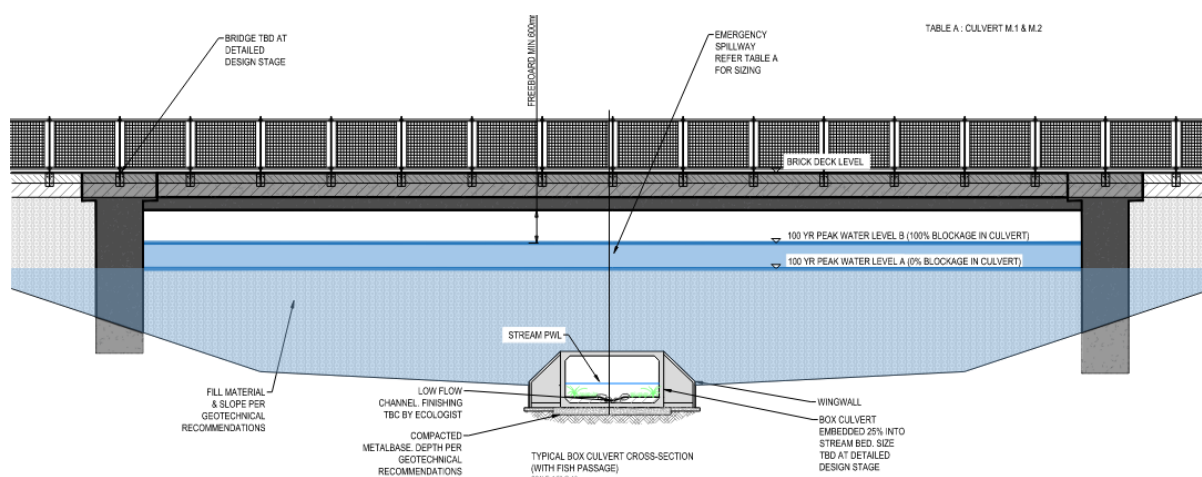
Mangaheka Attenuating Bridge-Culvert Typical Configuration
